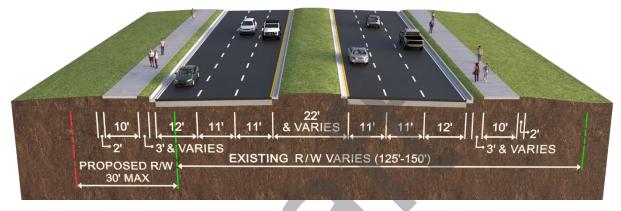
Gibsonton Drive – Proposed Typical Section
